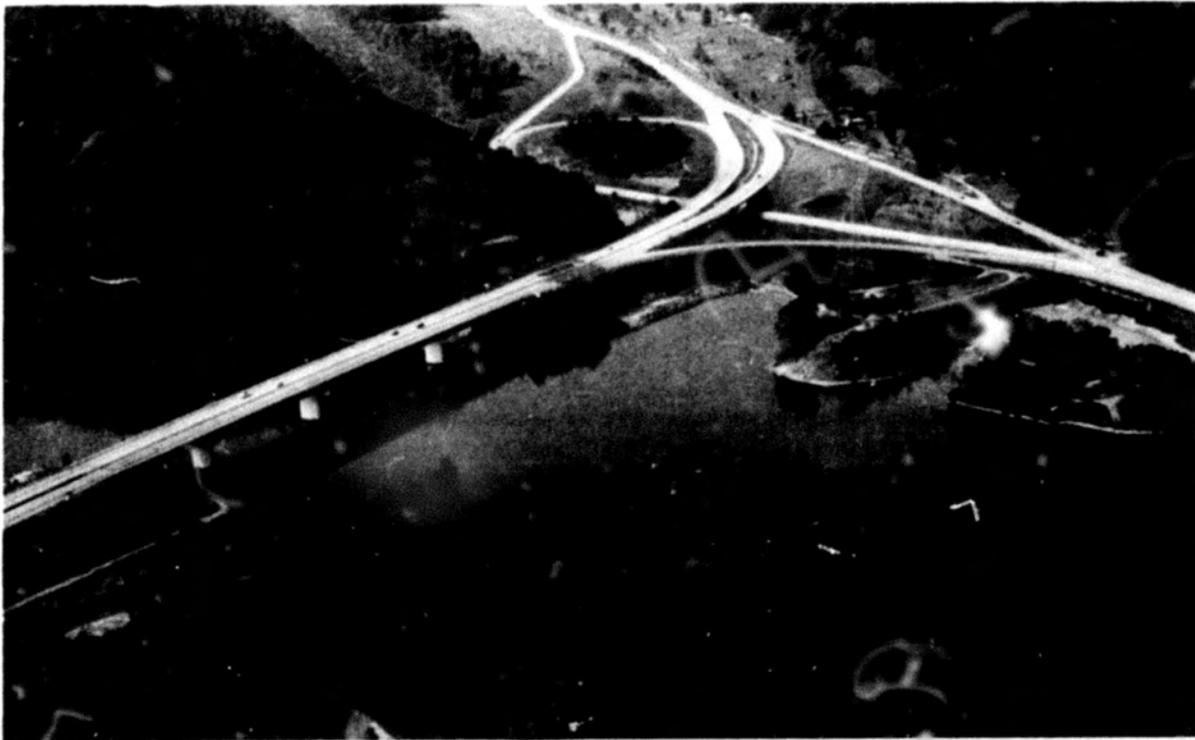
Solway bridge (looking west toward the Oak Ridge Reservation).
